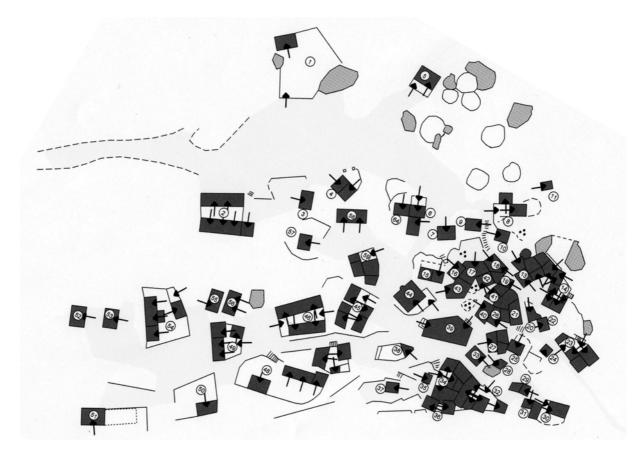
General plan of the central housing area of Maqta (Oman) with arrows indicating the access to the respective building.
